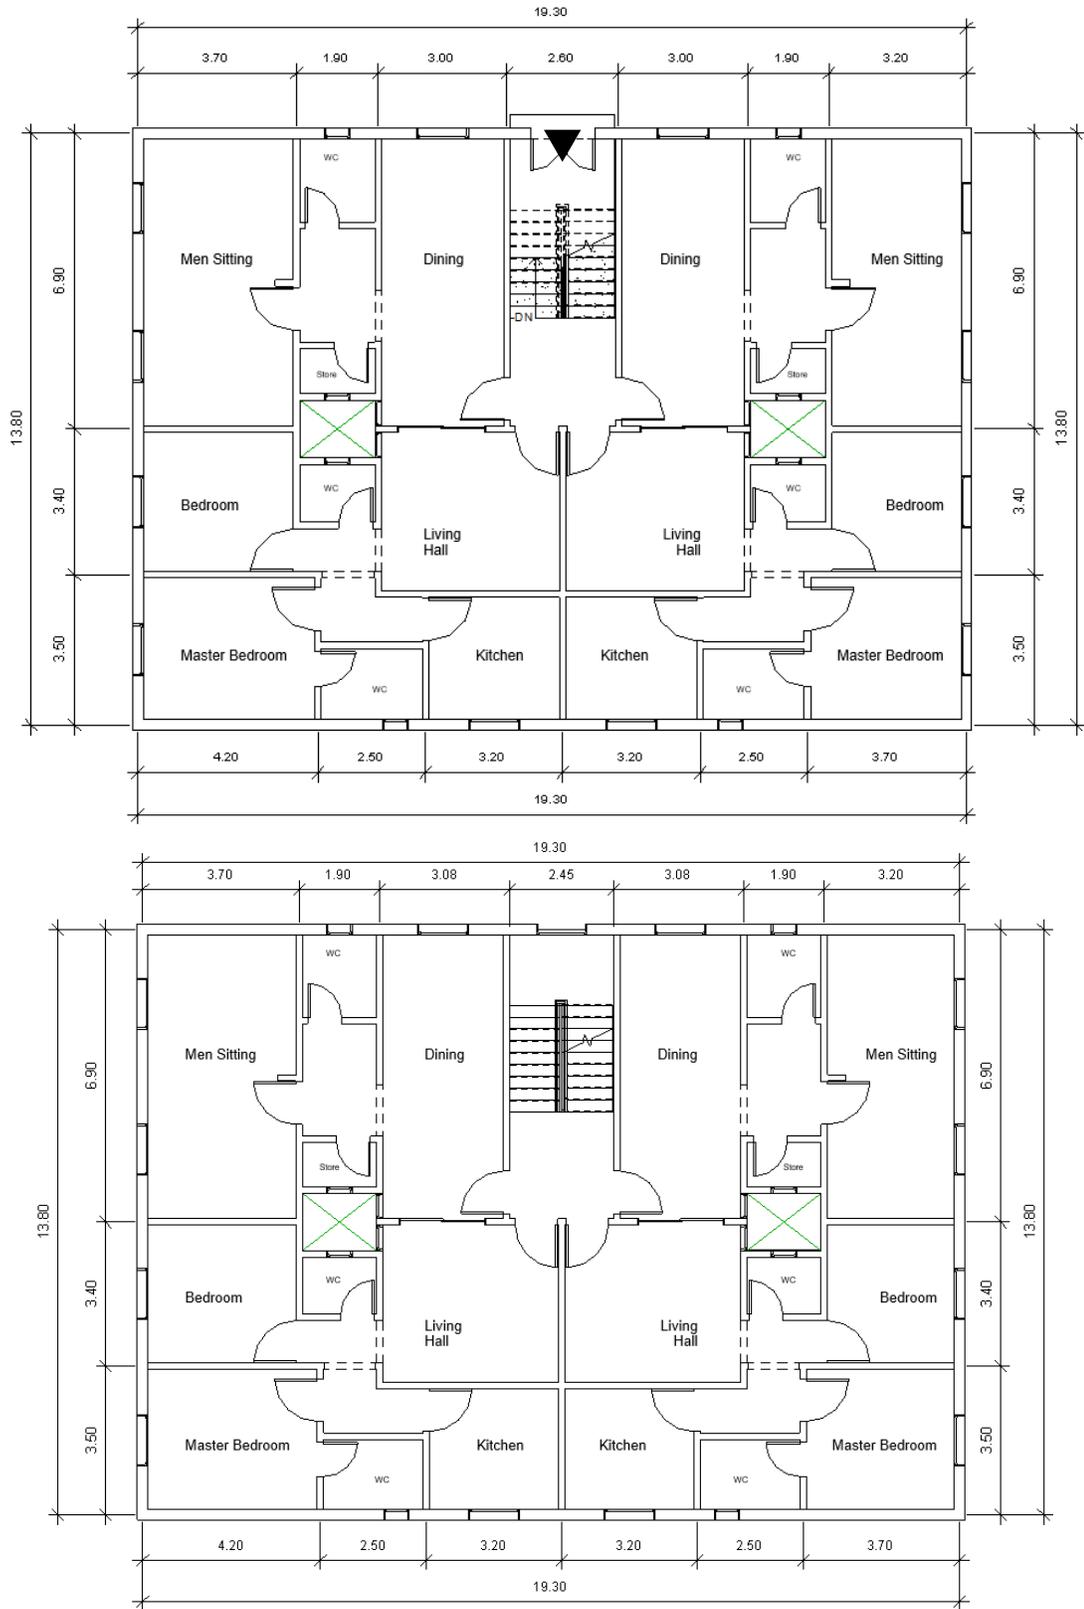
Top: Ground Floor Plan, Bottom: Typical Floor Plan
